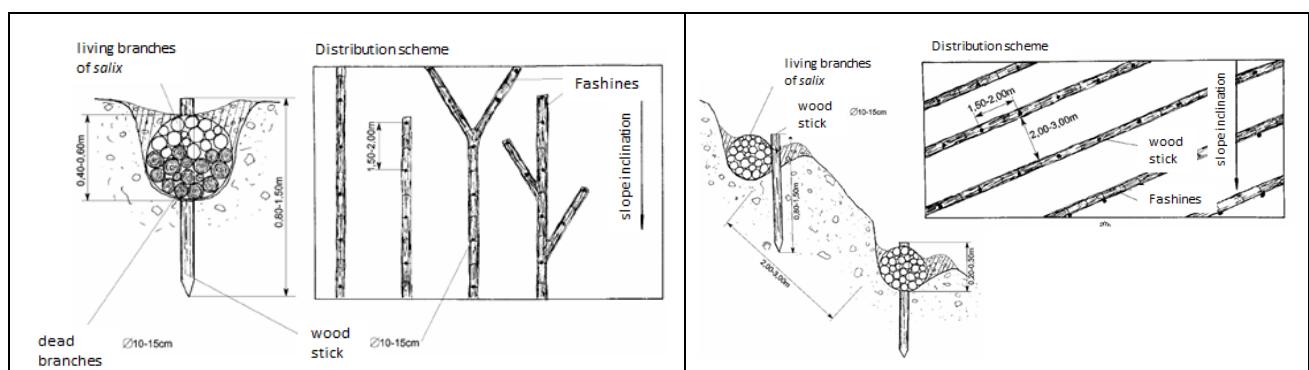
Ensuring geotechnical stability in lignite mine closure: bioengineering stabilisation and erosion protection for earth structures, here: Living branches of *Salix* are arranged as fascines for slope stabilisation with drainage function.
